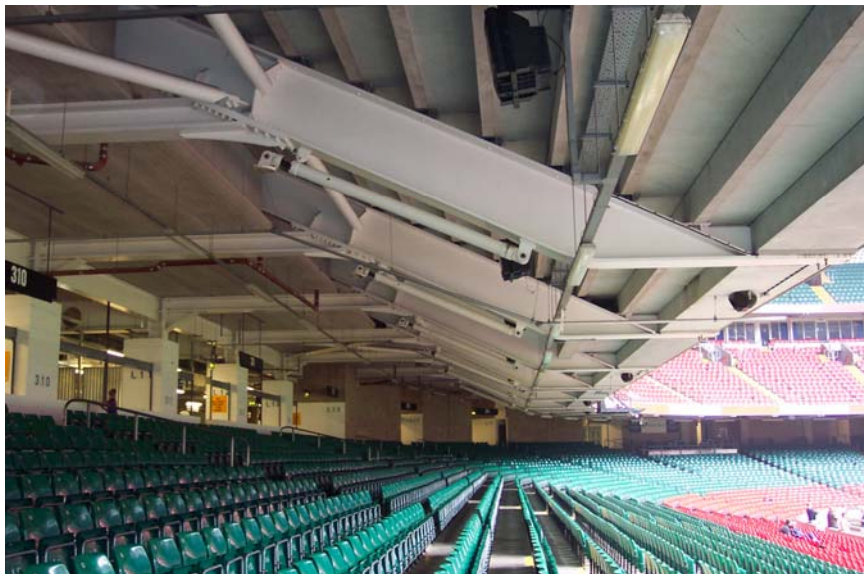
Cantilever structure of the second tier; temporary props beneath the steel rakers
